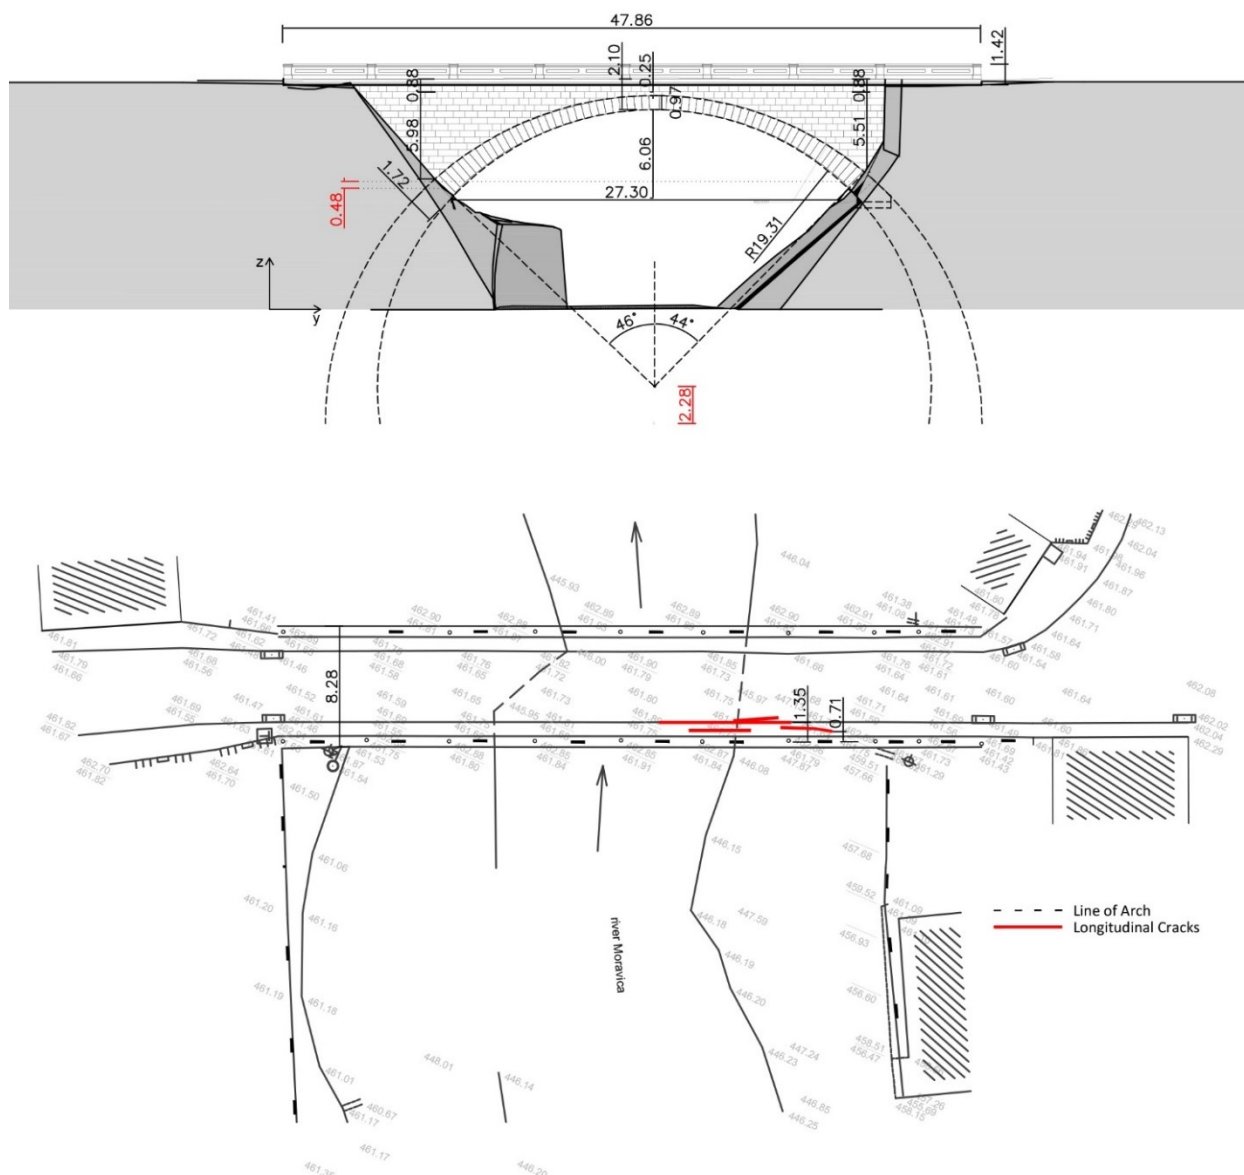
Geometric characteristics of the bridge: span, depth and arch rise, with highlighted position of developed longitudinal cracks.
